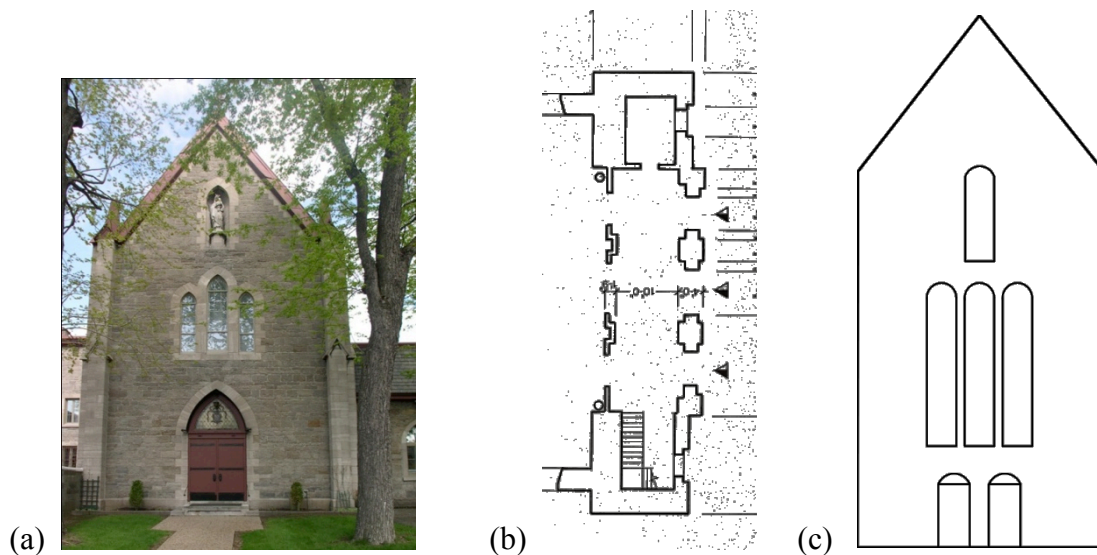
Baillargé church: a) Single aisle; b) Floor plan of the facade; c) Facade typology
